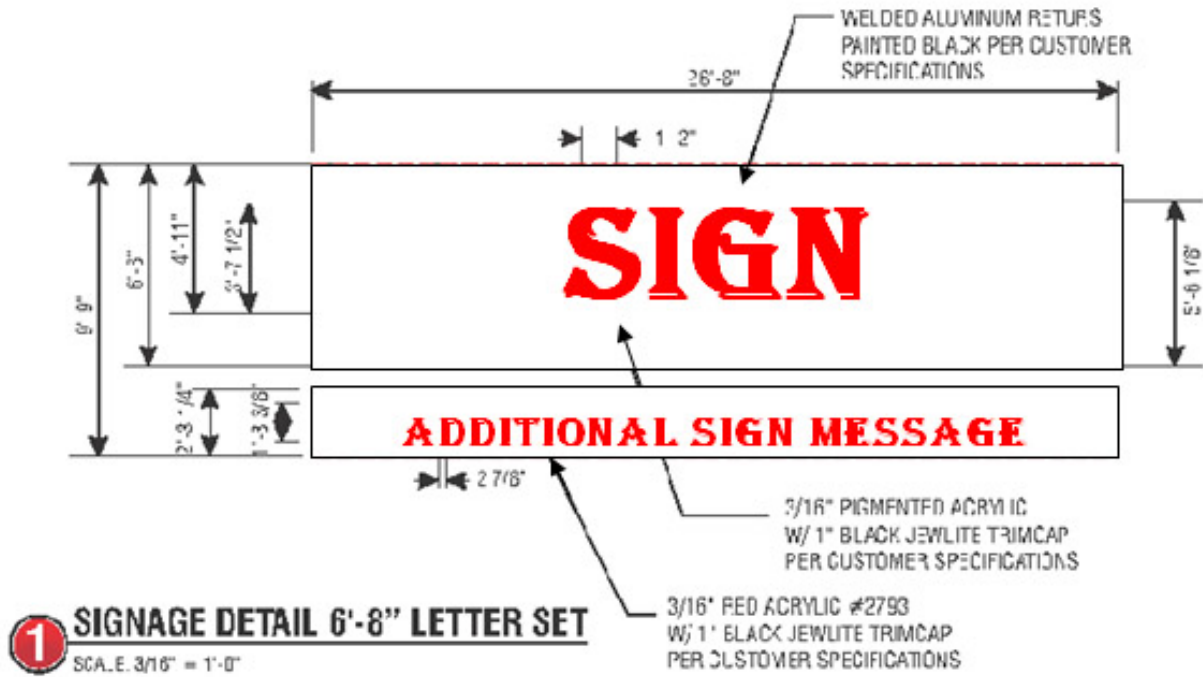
A.2 – Example of Wall Sign on Building Elevation
